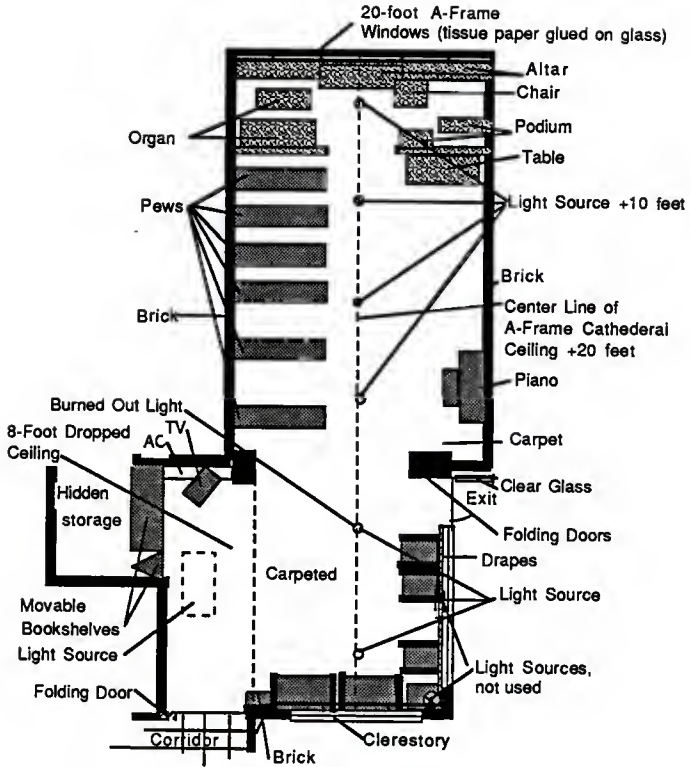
The Chapel & Lounge Plan. (Scale: 1/8" = 1' 0" North Δ).
